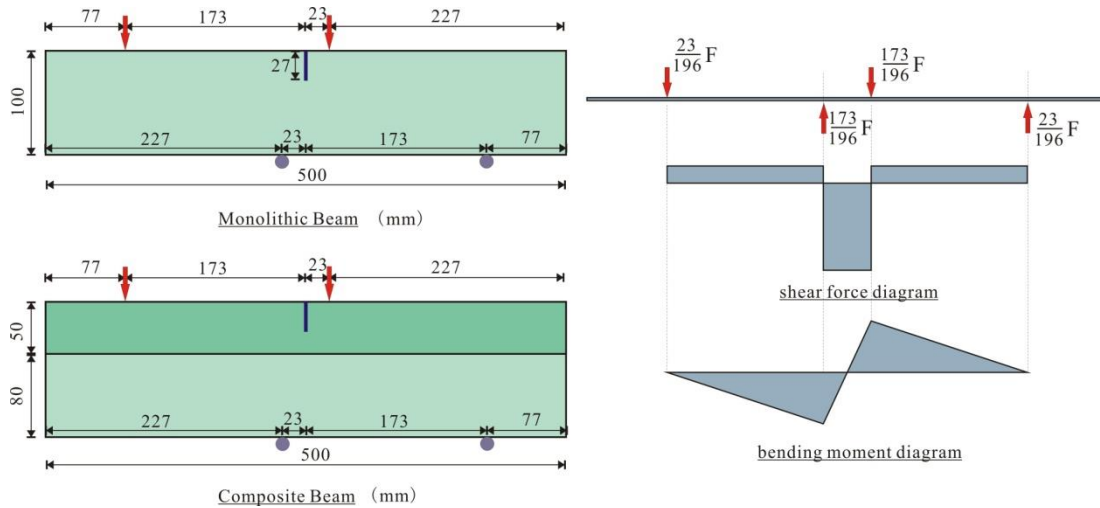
Arrangements for Monolithic Beams and Composite Beams (Left) Shear Force and Bending Moment Diagram (Right)
